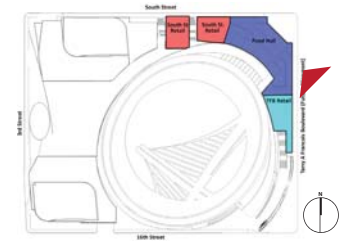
| ELEVATED EVENT WAY LOOKING WEST
